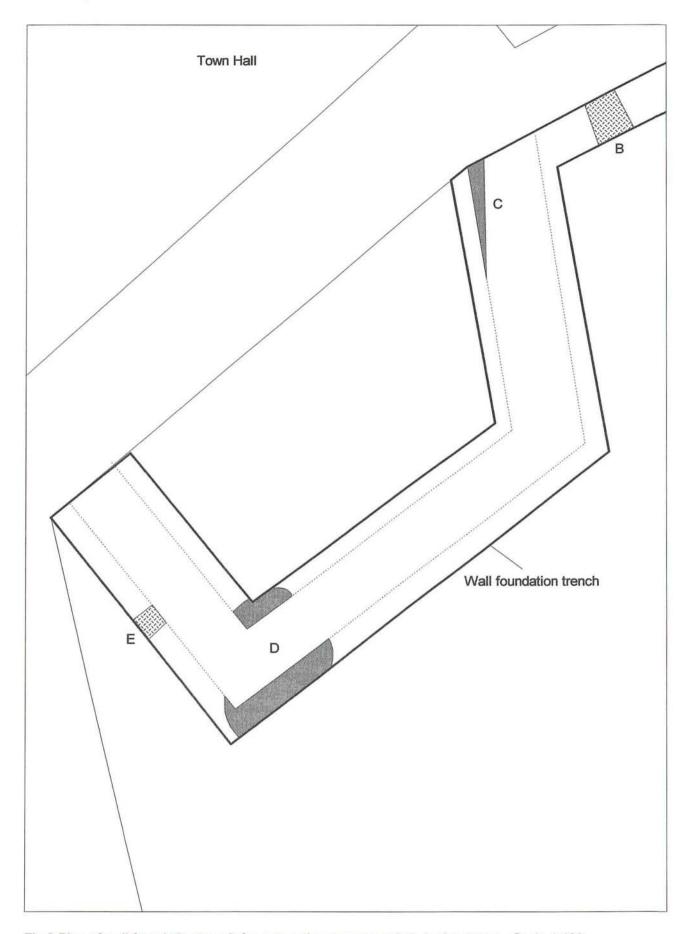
Plan of wall foundation trench for external ceremony and photoshoot area. Scale 1:100
